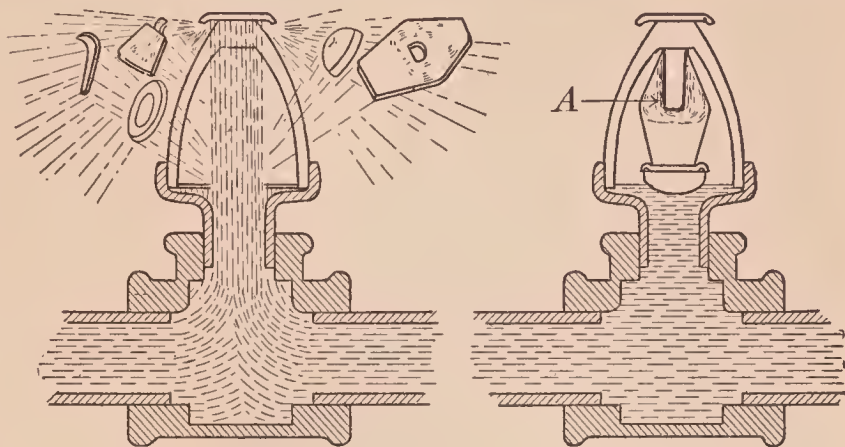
Sprinkler head — closed (right) and open (left). The parts of the dismantled head are shown (left). Fusible metal in place at A (right).
